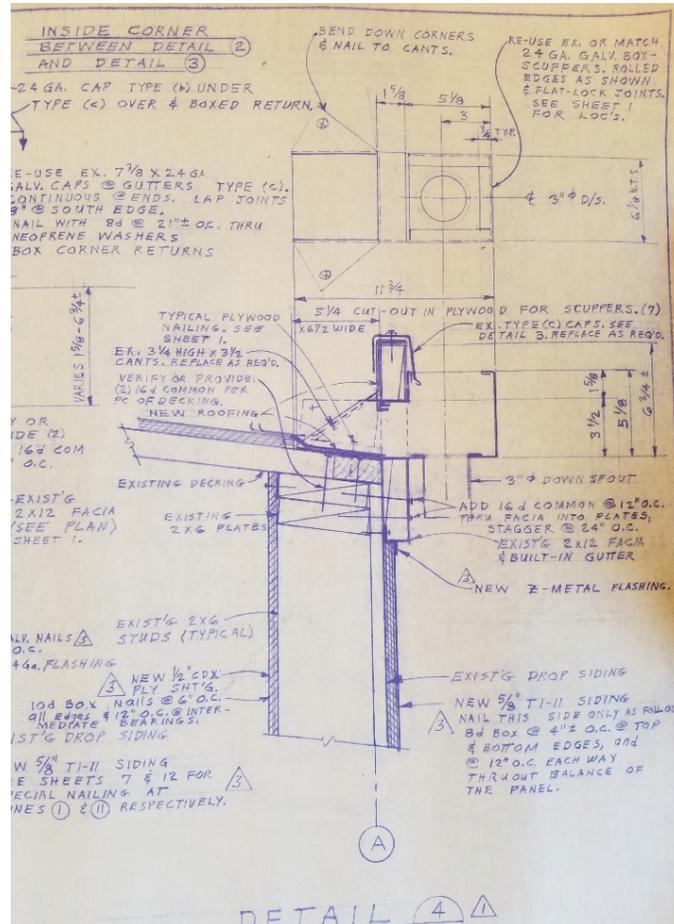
Detail 4 on Sheet 9 of the 1983 drawing set; south wall to roof.
